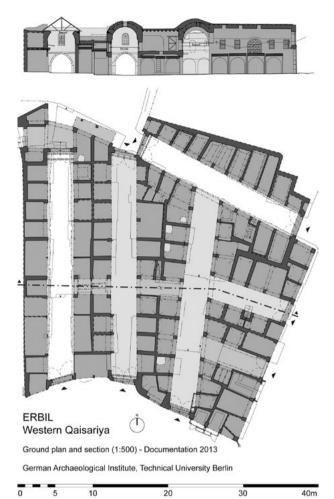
WESTERN *QAISARIYA*, GROUND PLAN OF THE GROUND FLOOR AND SECTION DRAWING (2013, TU BERLIN/DAI, ORIGINAL DRAWINGS D. KURAPKAT AND U. SIEGEL, DIGITISATION A.-M. ARERA AND O. ZENKER).
